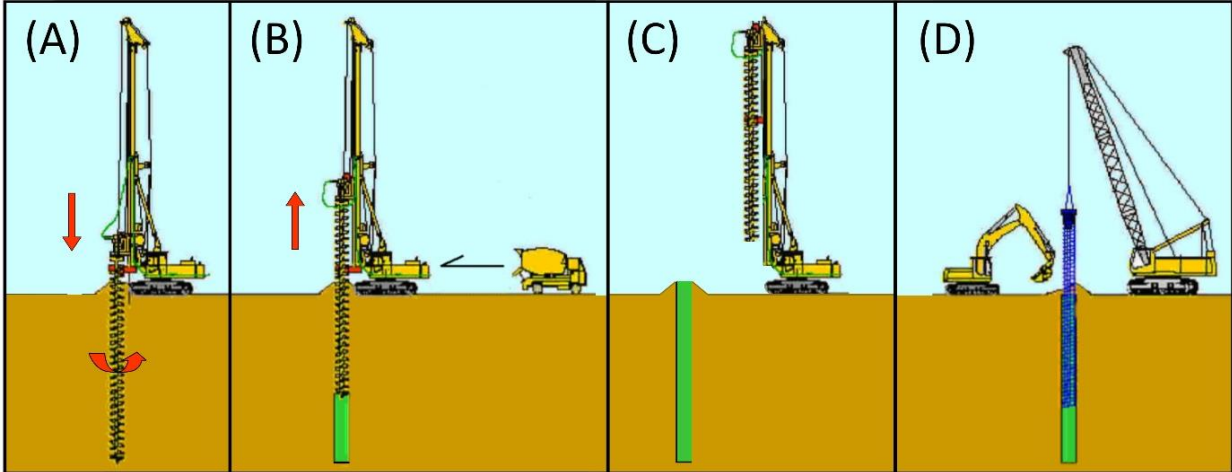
Auger cast pile construction process (a) drilling (b) grouting (c) pile completely grouted (d) cage placement; adapted from (Brown et al., 2007).
